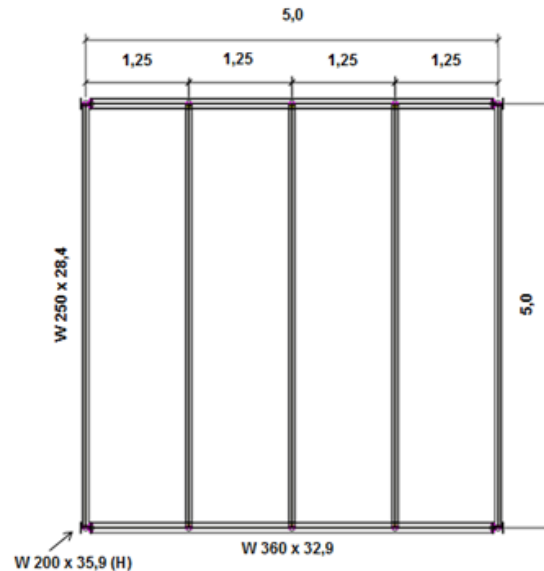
Composite floor (steel-concrete) analysed (dimensions in meters).
